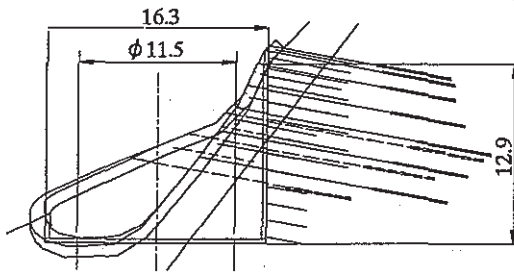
Plan and cross section for angle cut cylinder earth retaining
